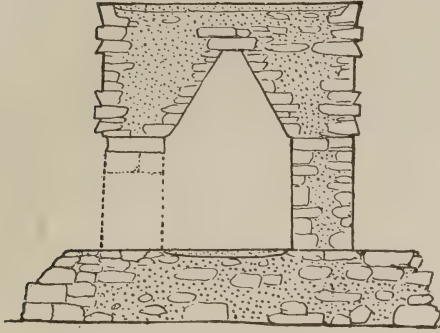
SECTION OF SMALL BUILDING NEAR THE VILLAGE OF CEDRAL,
